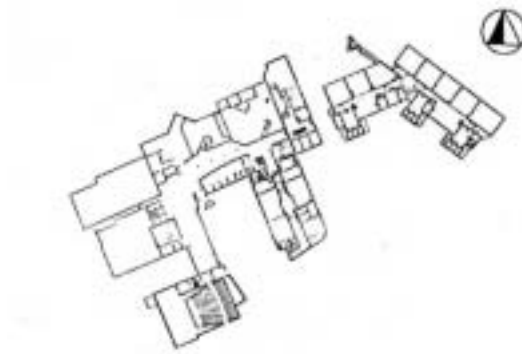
The site plan. The primary school is the building located to the upper right.
